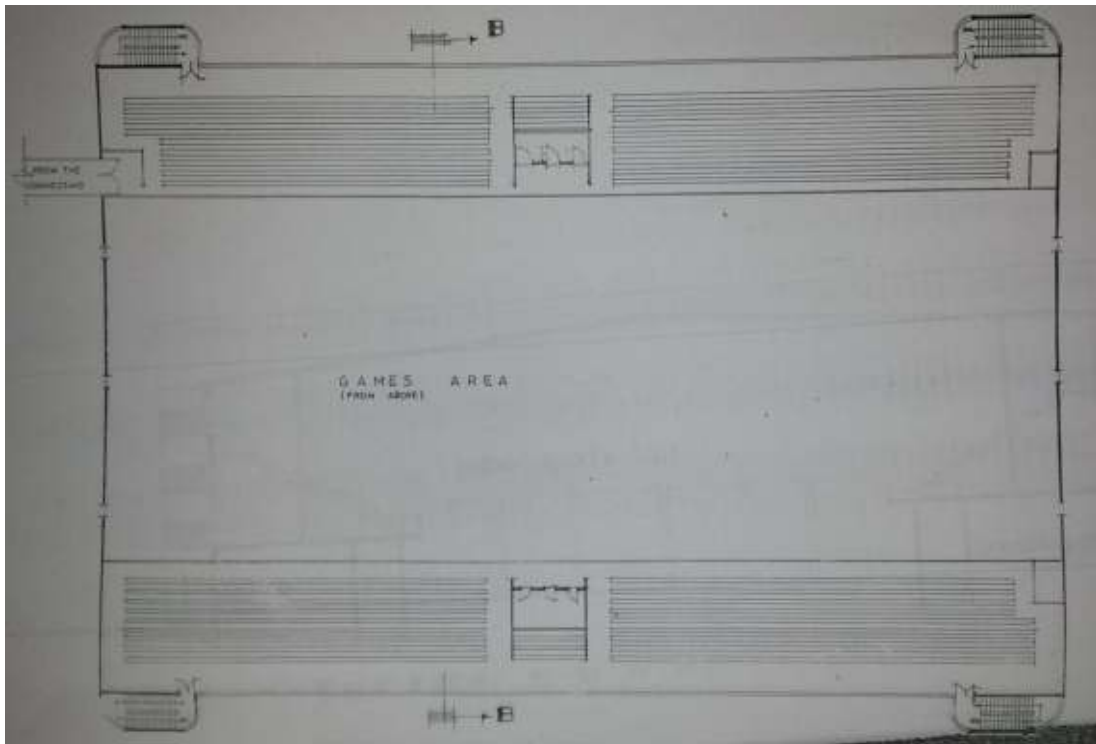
Showing upper floor plan of UNILAG indoor sports hall.
